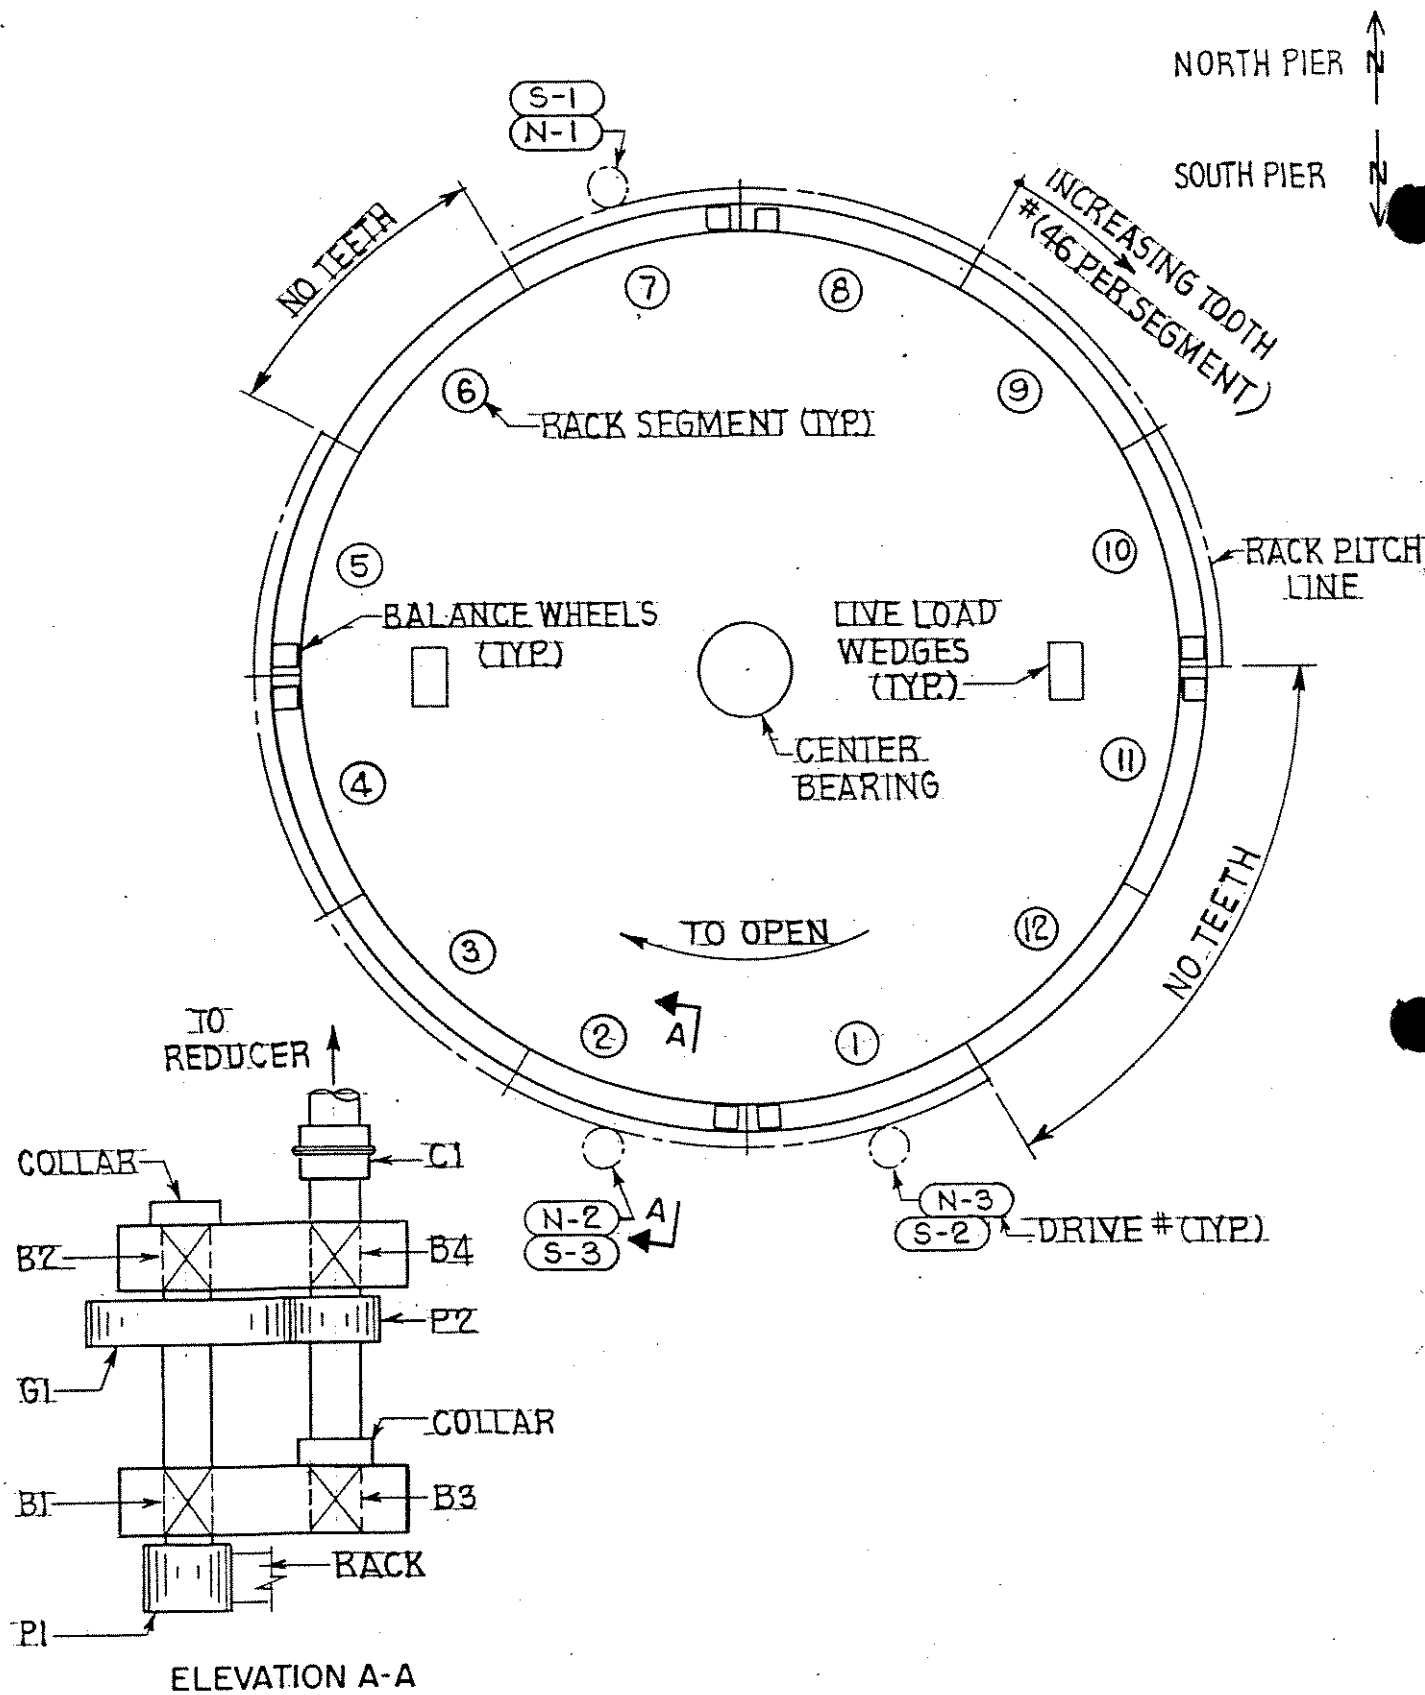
GENERAL ARRANGEMENT AT PIER TOP
